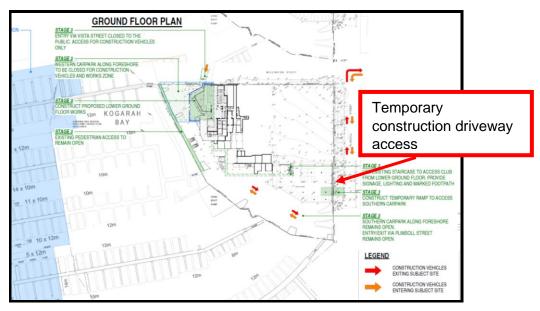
Proposed temporary construction vehicle access (Source: Innovate, Revision F)
